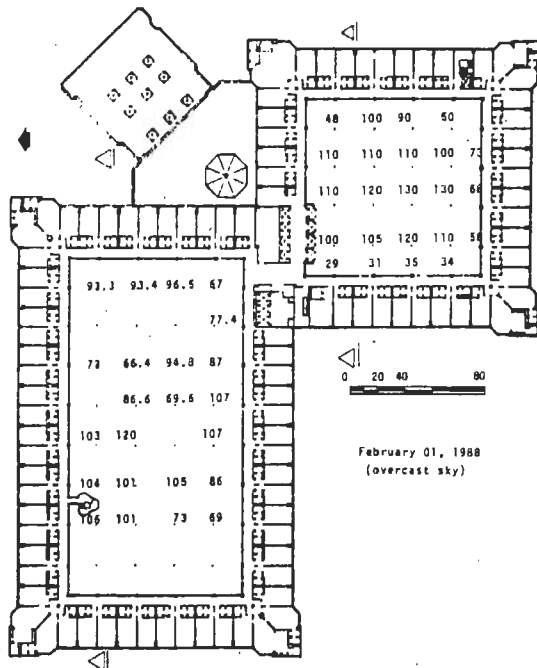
Floor Plan of the Two Atriums with Illumination Readings Normal to the Floor
